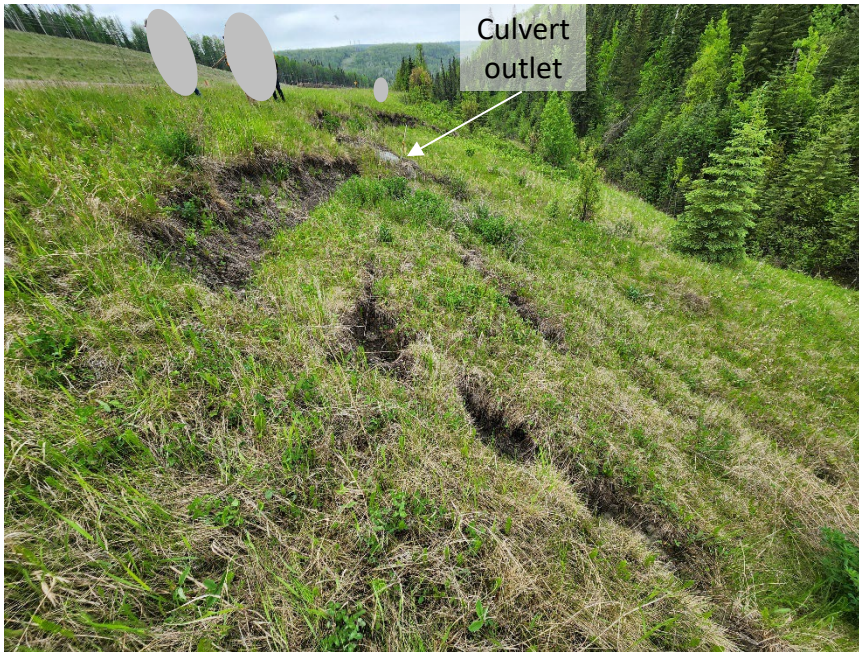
Slope failure and slide scarps between Hwy 40:38 and Roseham Creek. Photo taken June 11, 2024, facing north.
